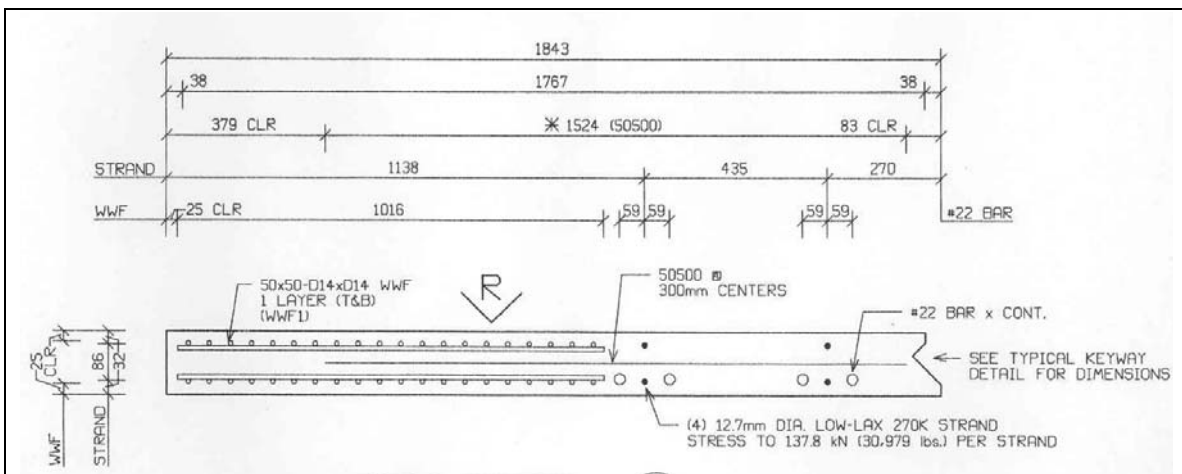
NU-Deck end panel cross section (NDOR, 2003)
